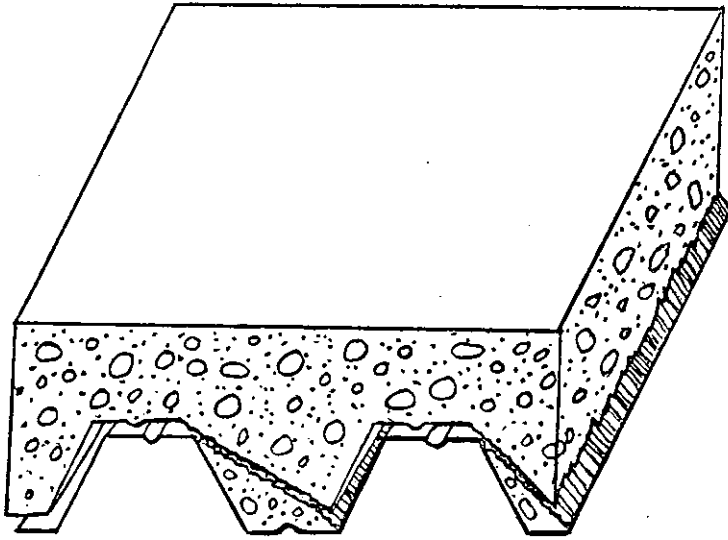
Concrete shear transverse failure (Failure Mode 2.b.2)
